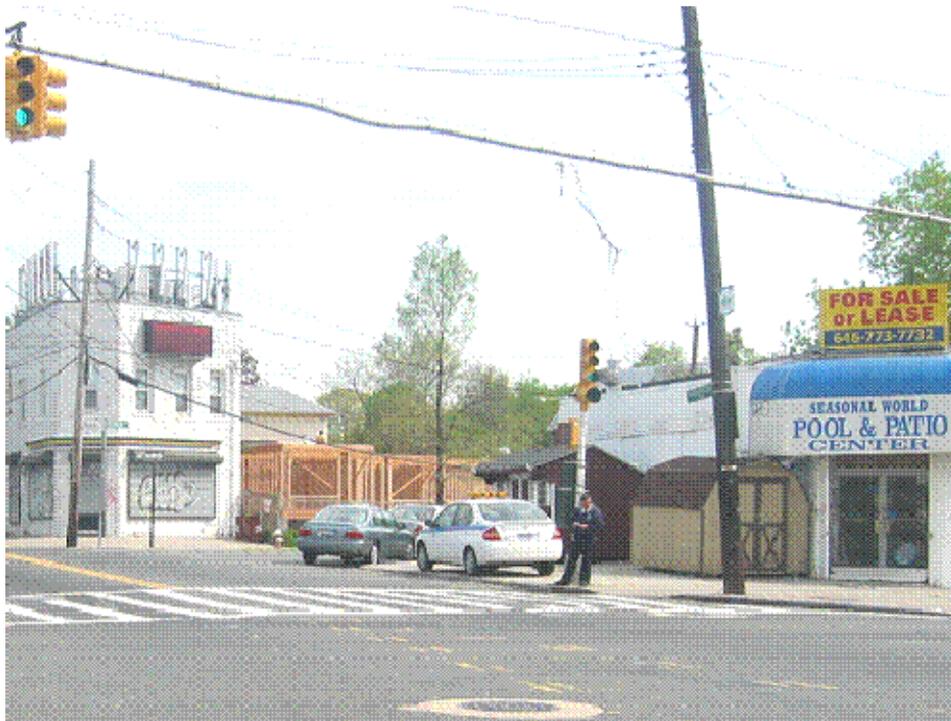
Looking at northeast corner of Forest Avenue and Richmond Avenue at miss-located pedestrian ramp and pole obstructing northerly crosswalk.
